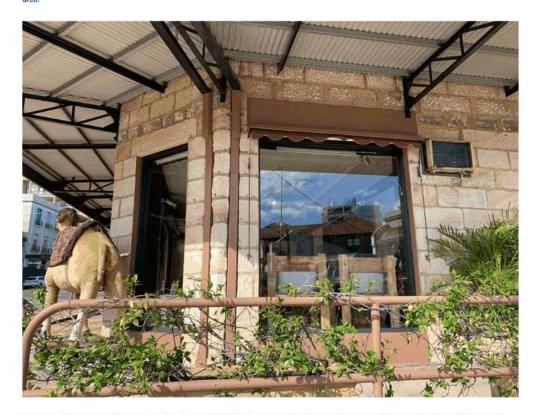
Glenmore Road frontage, including underside of awning and downpipe detail, and intrusive services such as air conditioning units, May 2021.
